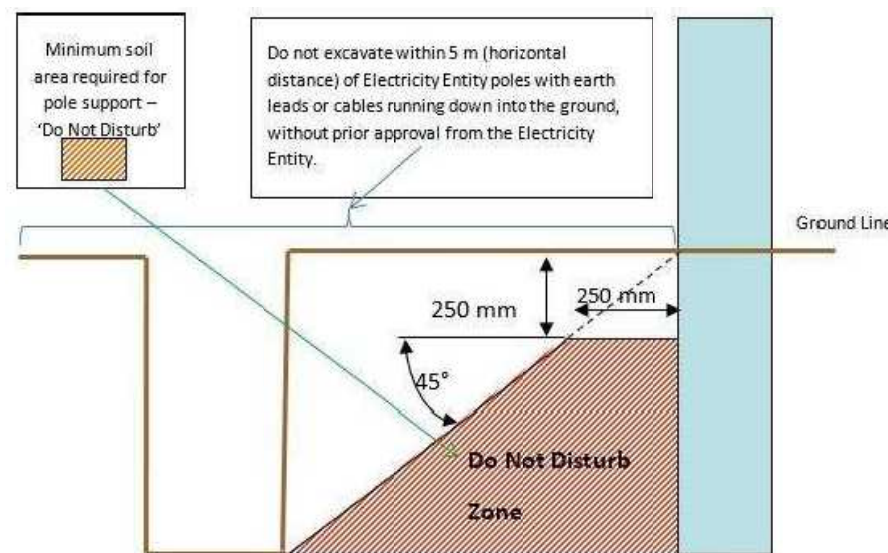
Do Not Disturb Zone requirements when excavating near poles
